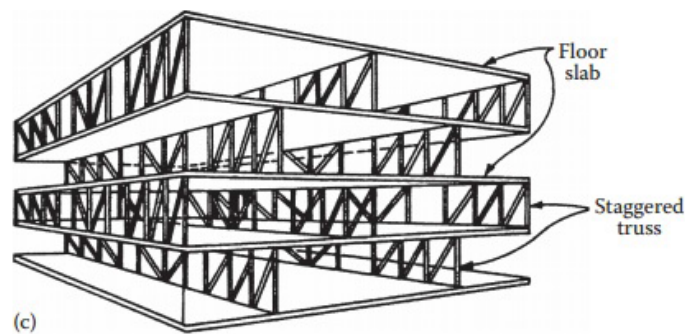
Illustration of a staggered truss system (Rist,V.C.& Swensson S. 2016)
